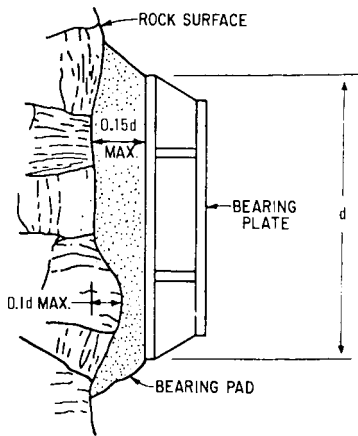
Allowable Dimensions for Rock Surface and Bearing Pad
